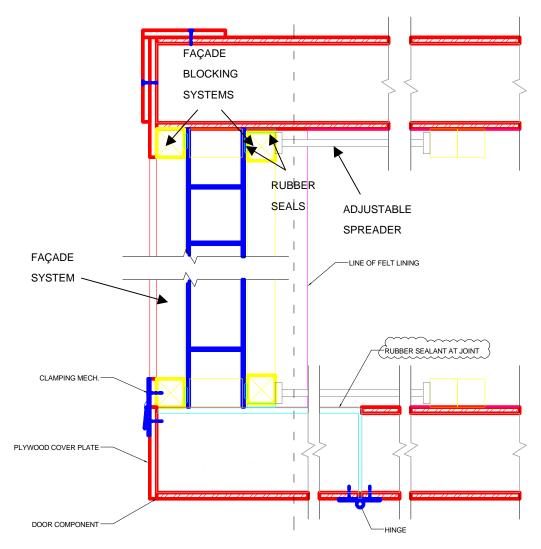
AutoCAD model of thermal chamber door assembly details [14]
